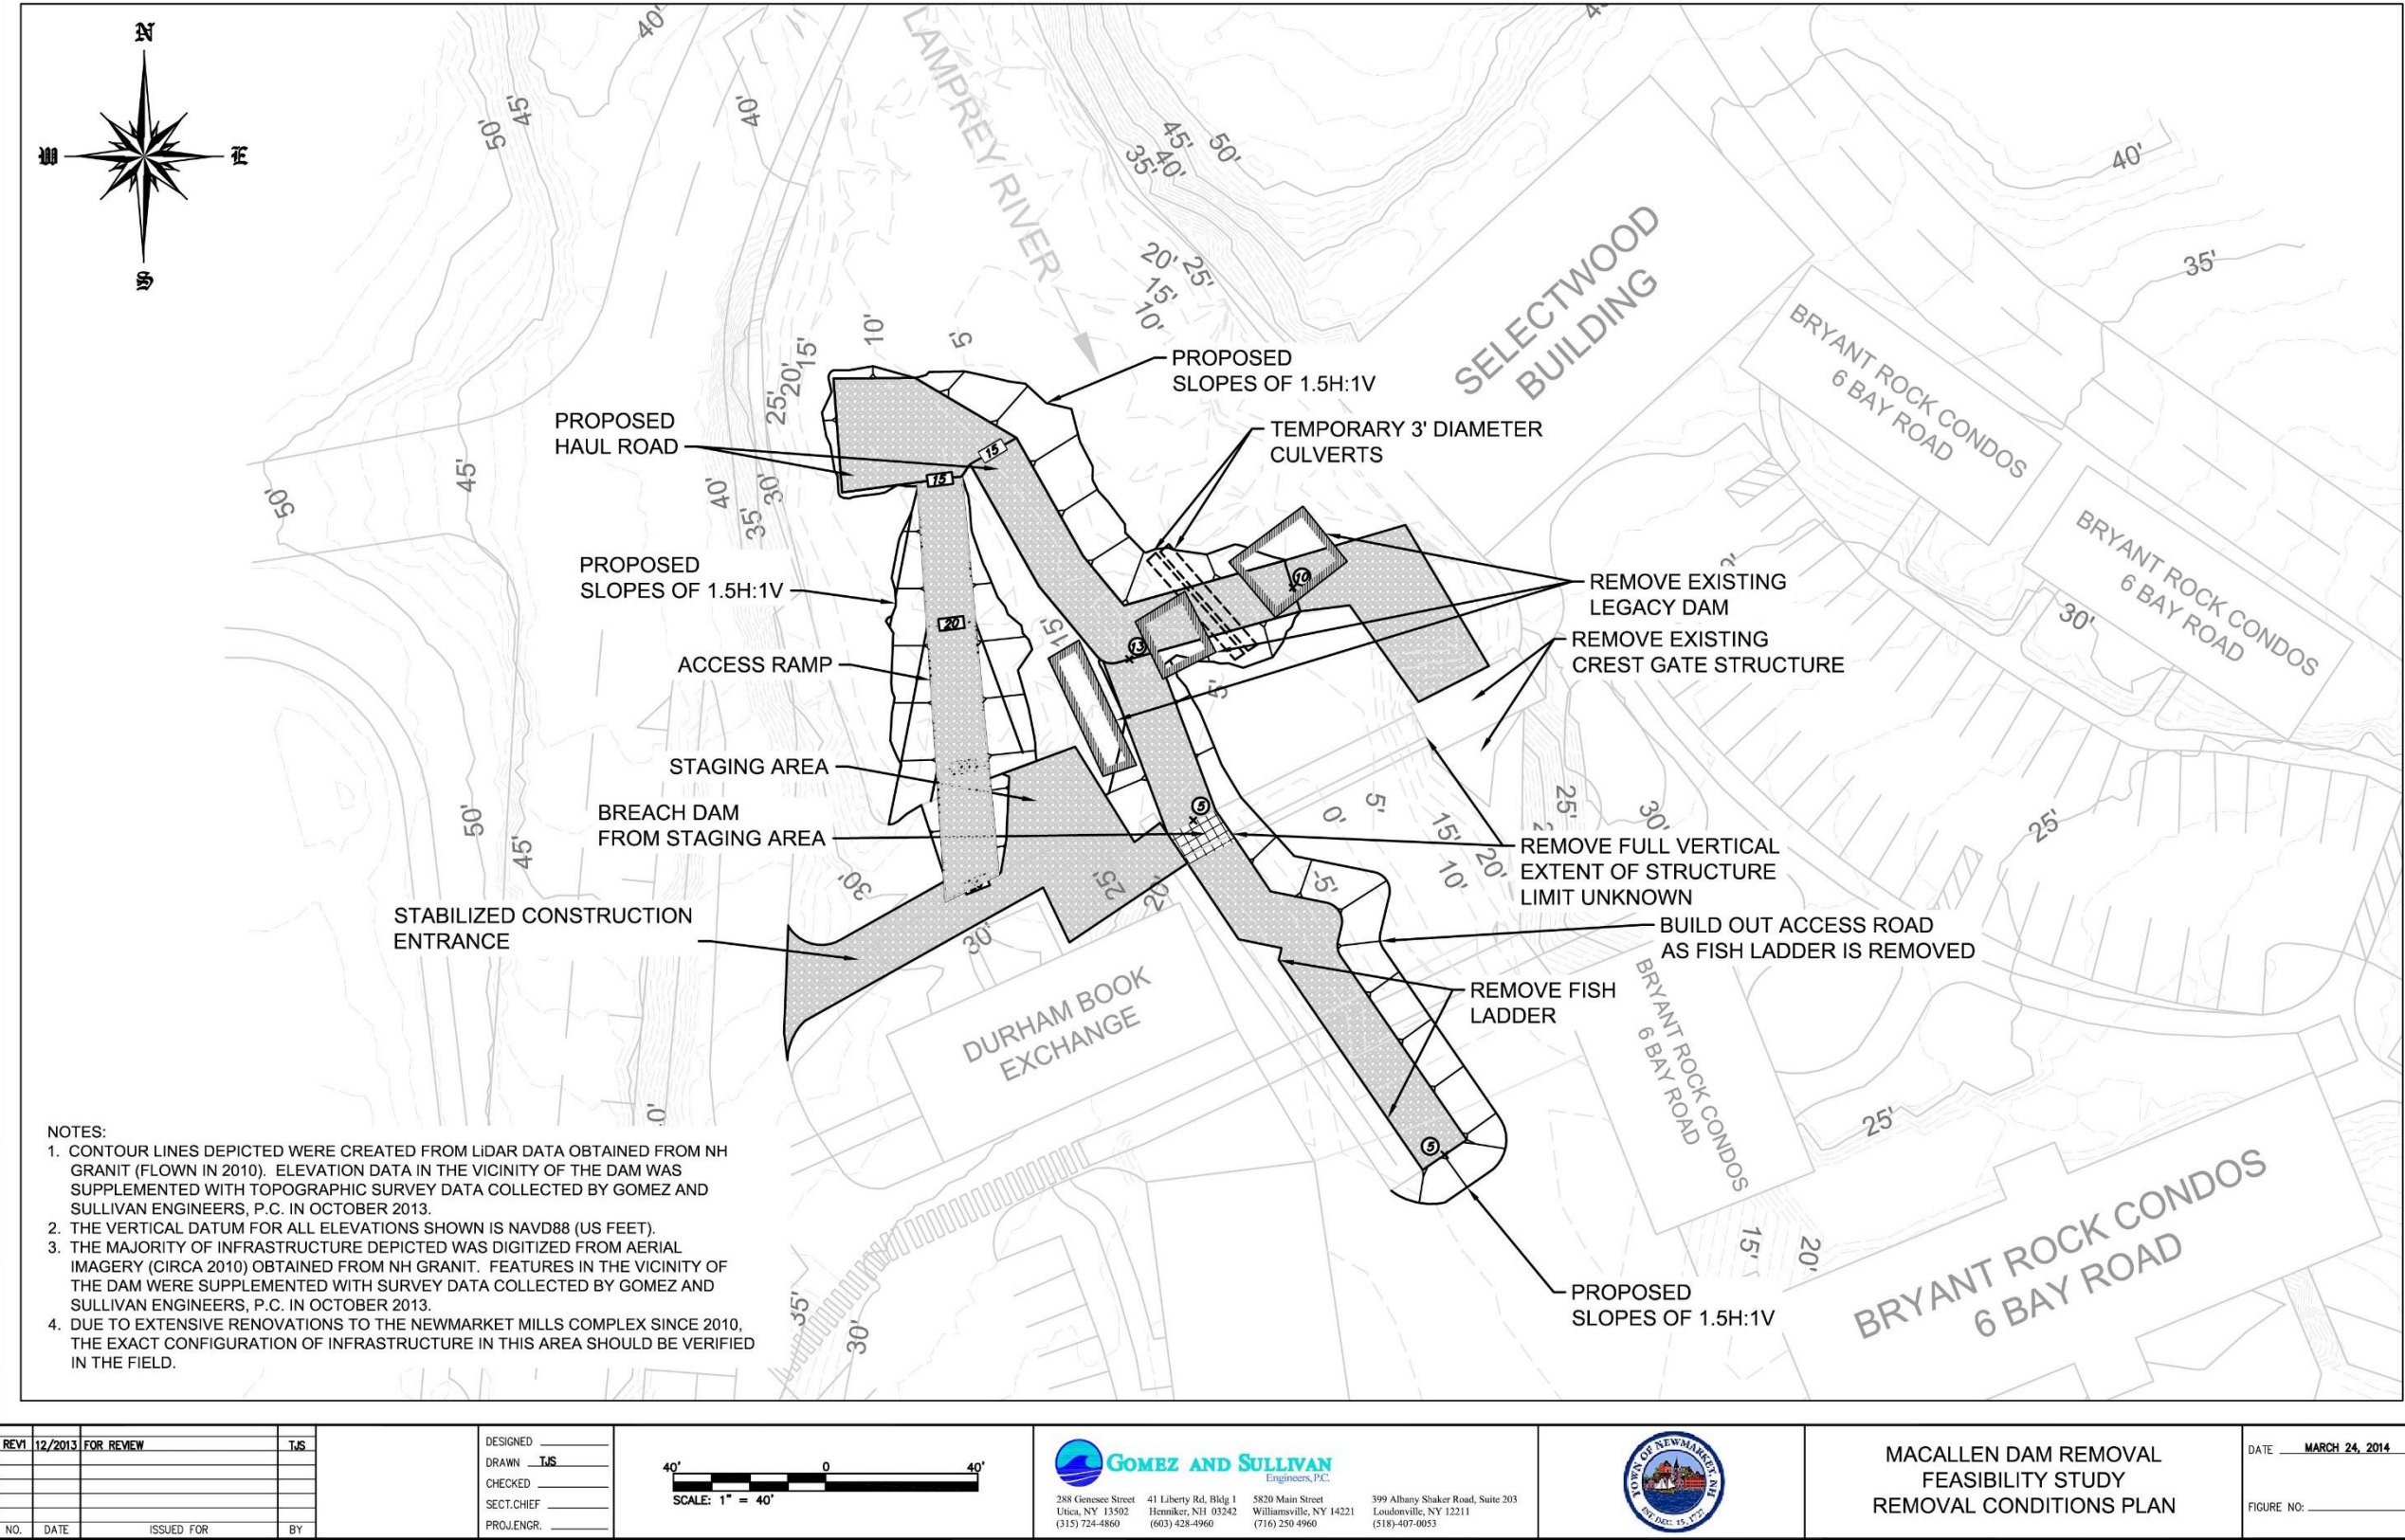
Conceptual Dam Removal Plan Drawing
